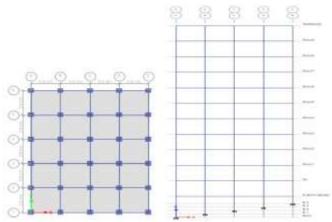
Plan & Elevation for model with slope angle of 45^o without Shear walls.
